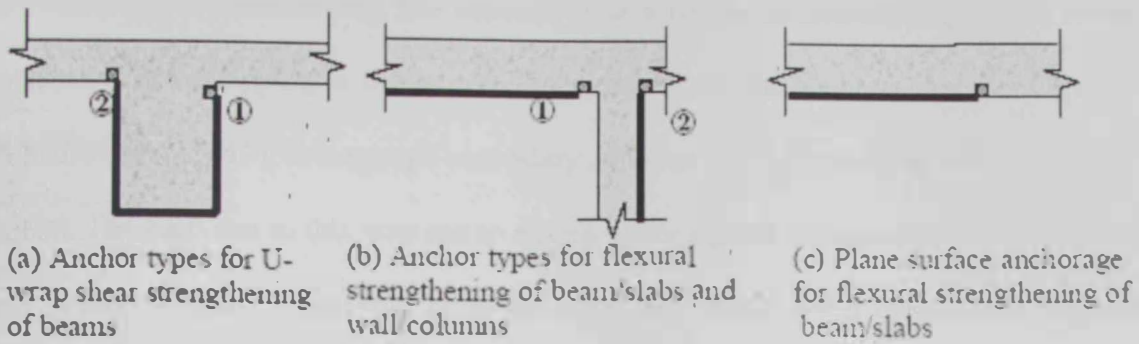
Example of application for anchorage system [Khalifa and Nanni, 1999]
